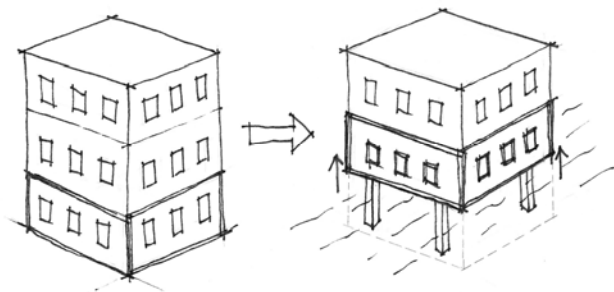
Plasticity for multiple ecological regimes can be accomplished through new design and engineering. A variable ground floor could be provided by building with pilotis and raisable walls.
